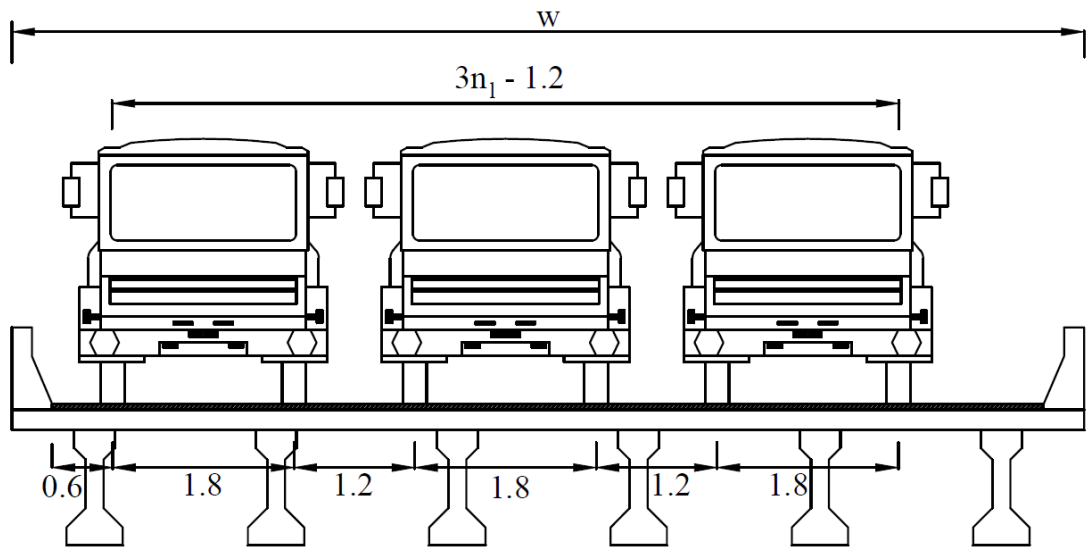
Transverse loading of bridge superstructure (dimensions are in meters)
